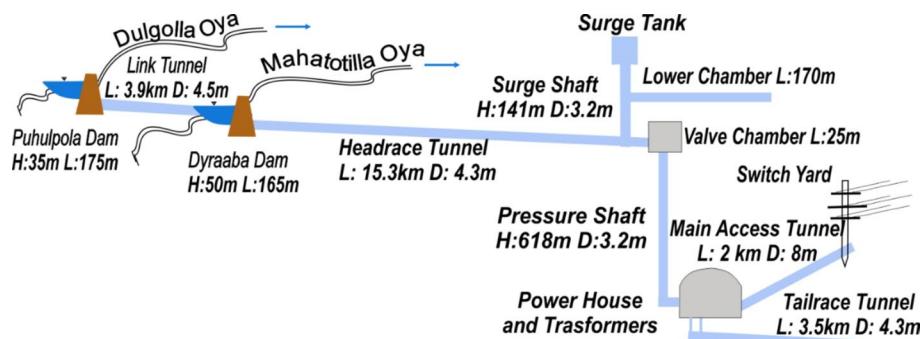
Schematic diagram of project layout plan showing, two dams both constructed by roller-compacted concrete (RCC), tunnels, subsurface powerhouse and valve chambers including surge and pressure shafts
